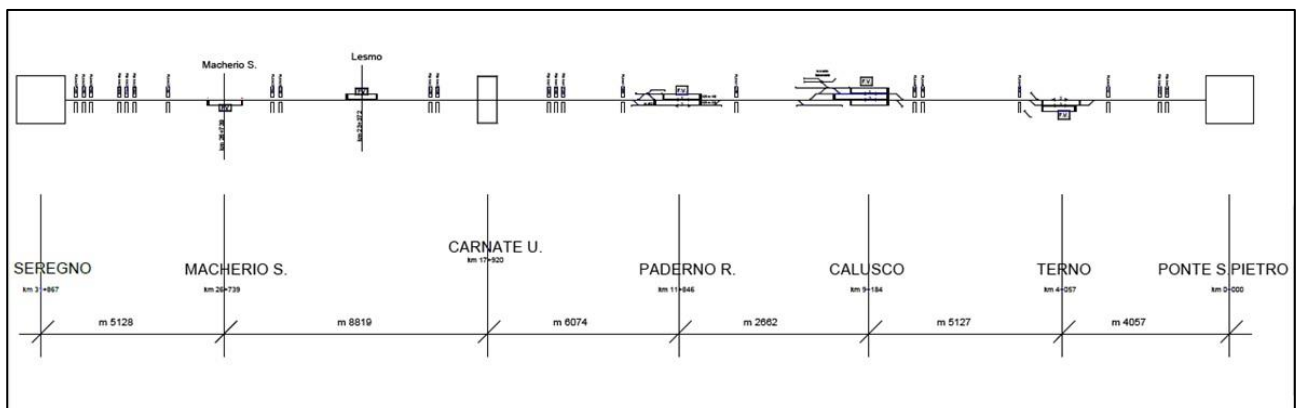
Layout of the section Seregno-Ponte S. Pietro
